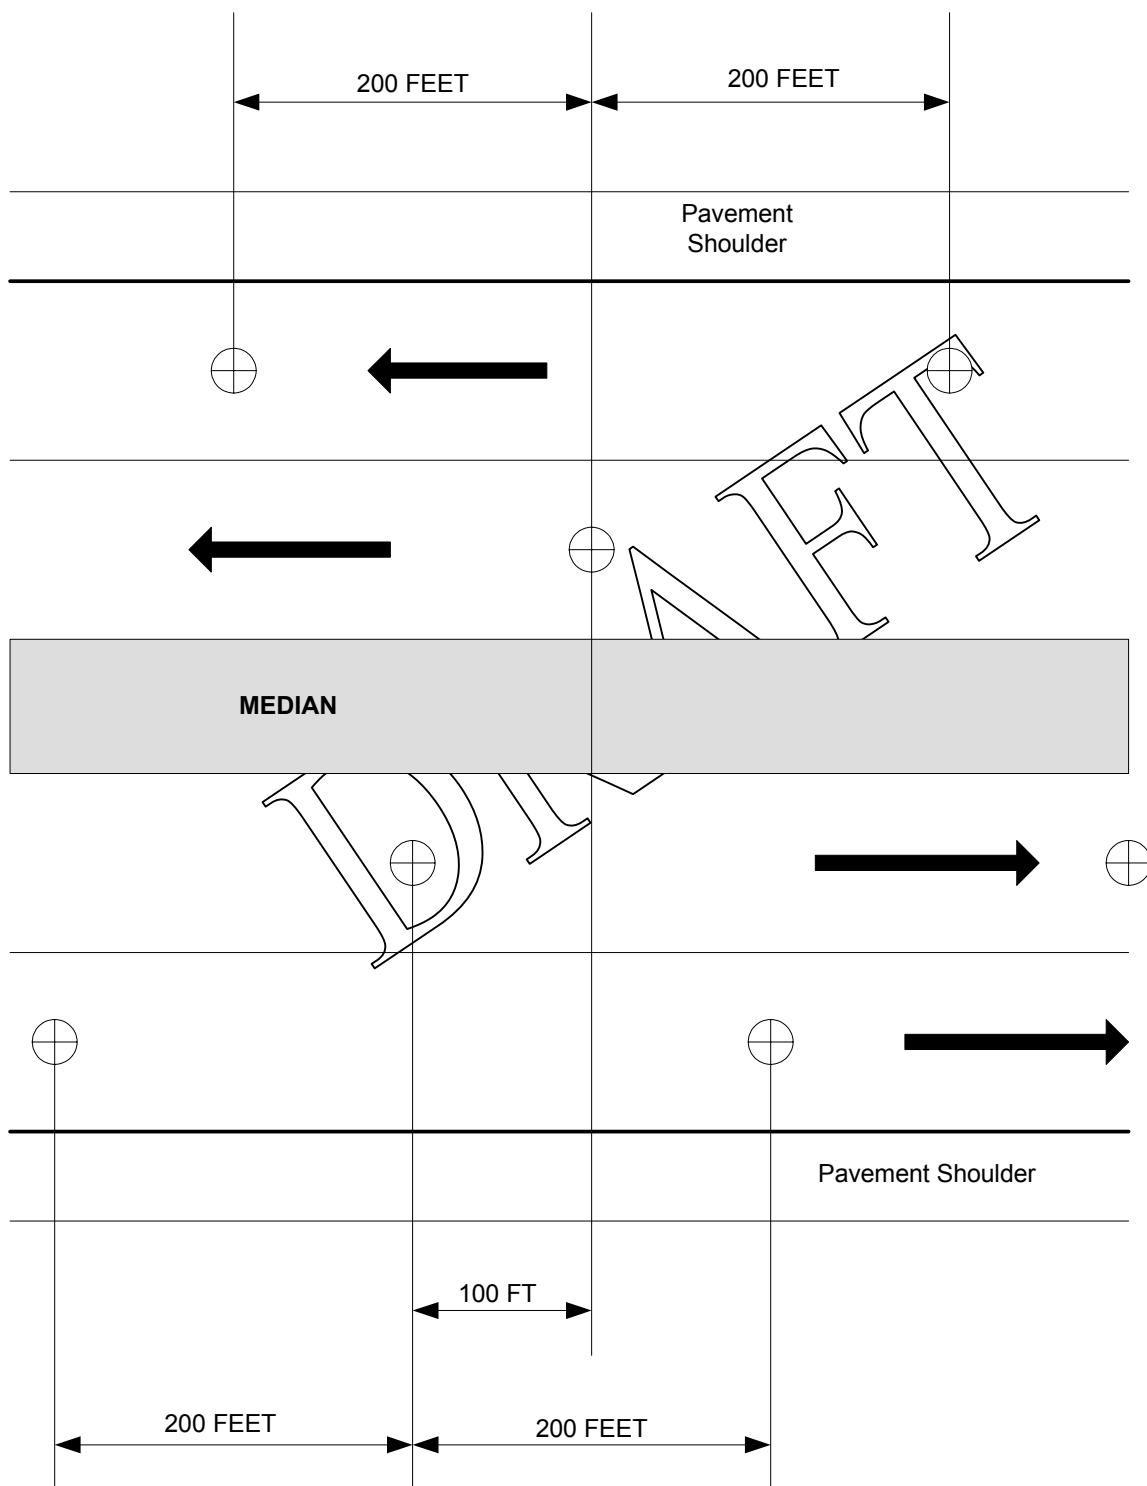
Boring Layout for a Four (4) Lane Divided Road
